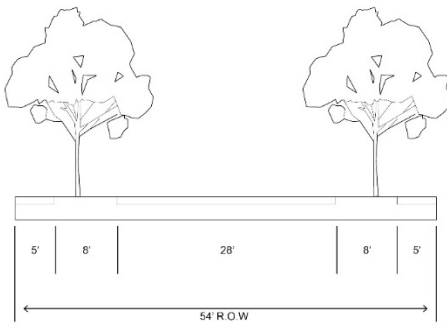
TN-3 Local Street TN-60 Parking
